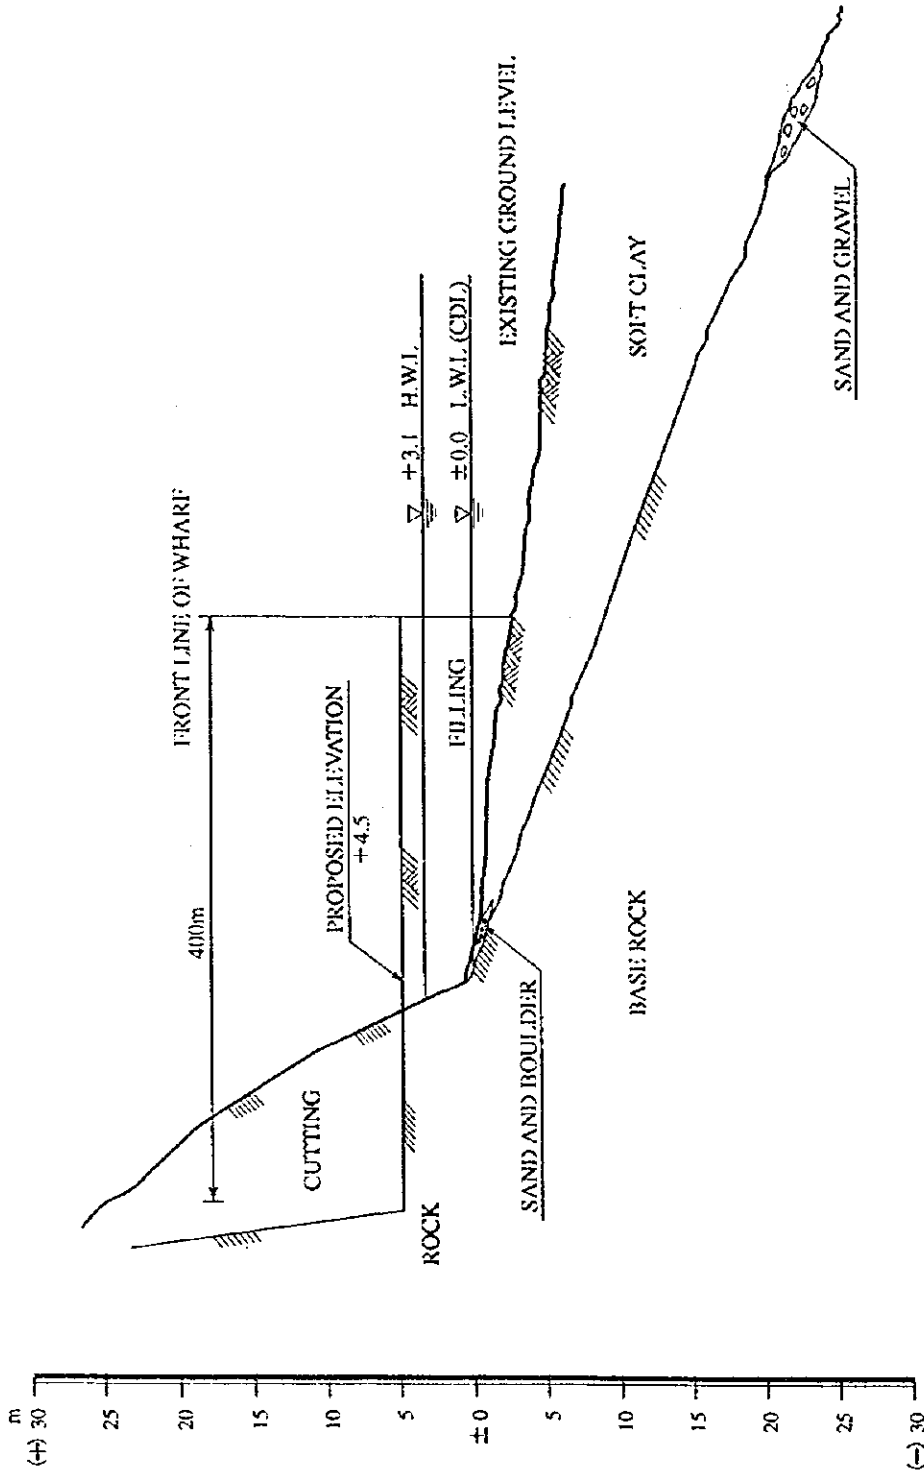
Typical Cross Section of Proposed Yard Behind The Wharf (site B-3)
